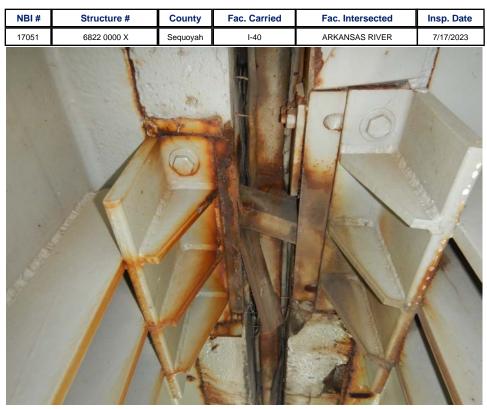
Looking west at the modular expansion joint in the south eastbound lane at pier 6. Note: repair of the transverse separation beam has failed and beam has dropped 1 inch.
